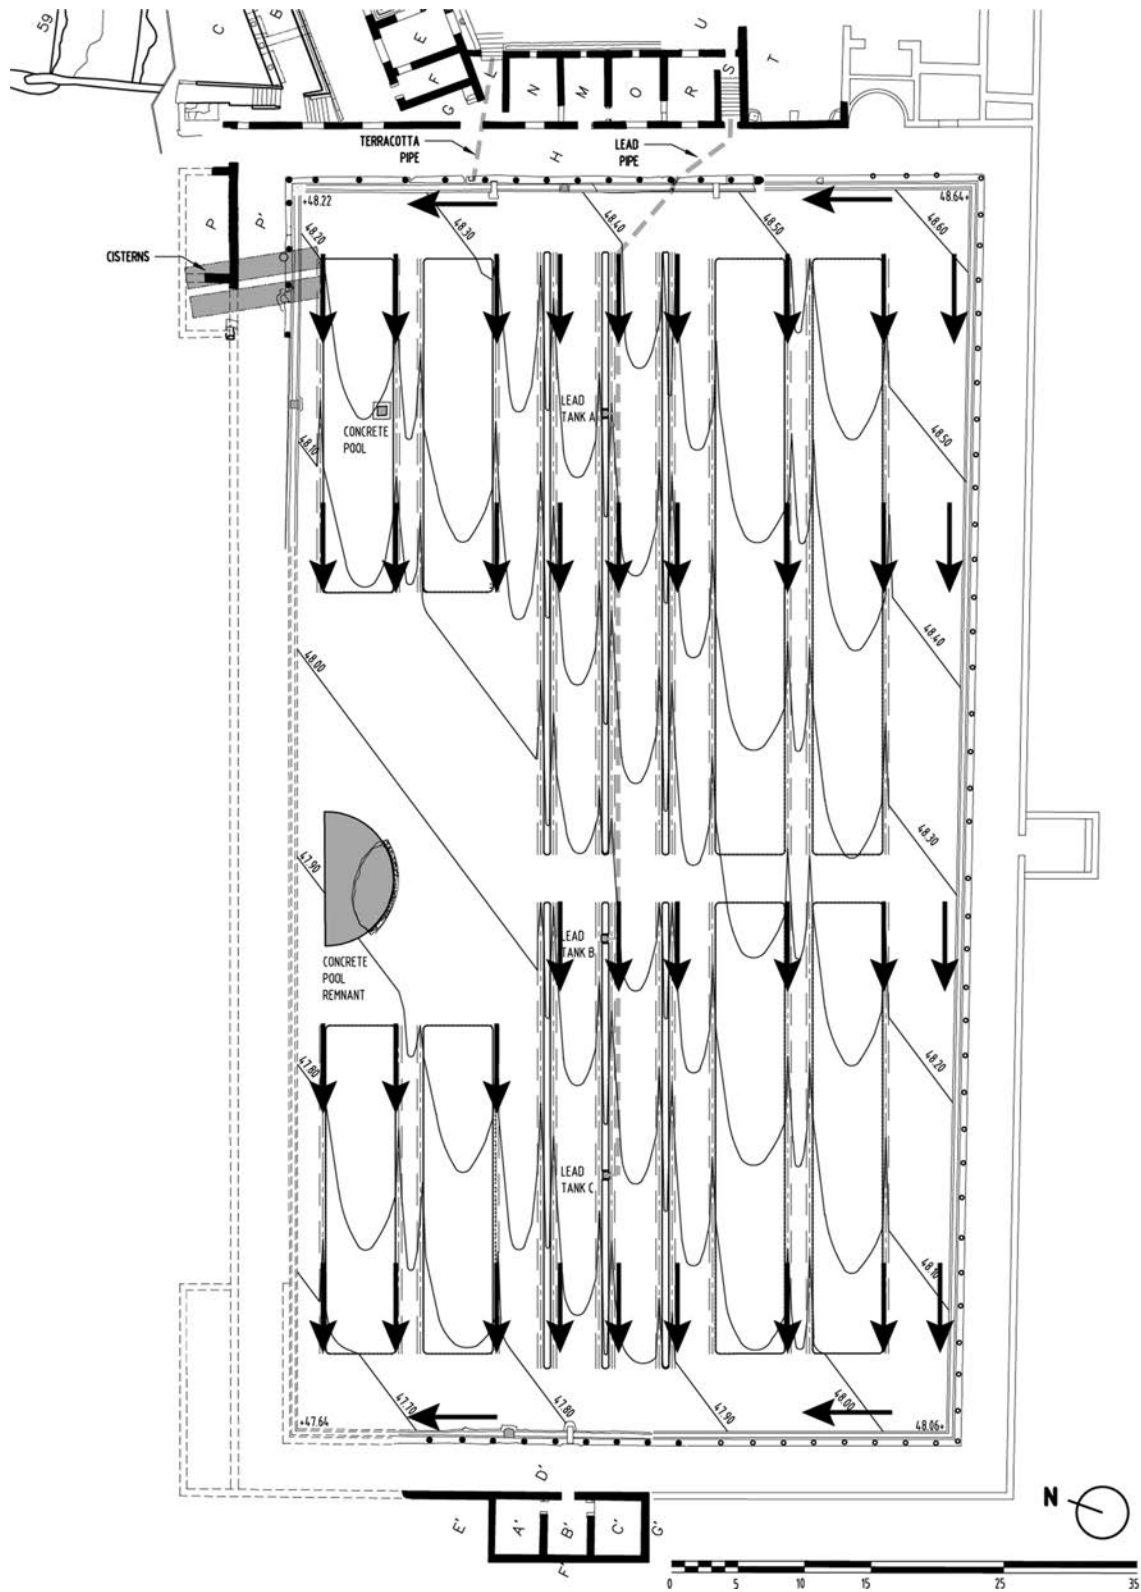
Interpretive grading plan of the Villa Arianna's Great Peristyle garden.
